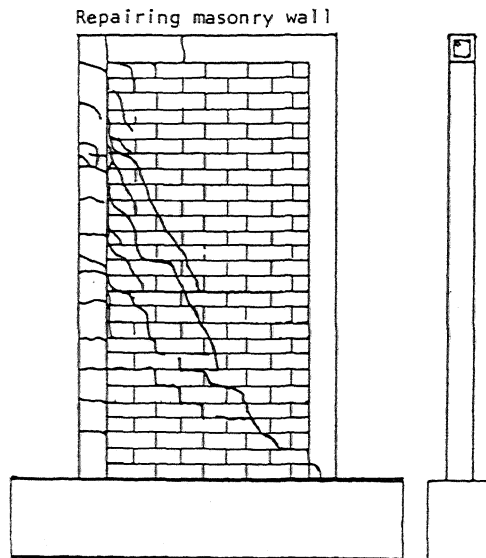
State of damage of original and repairing masonry wall (Technique N°2).
